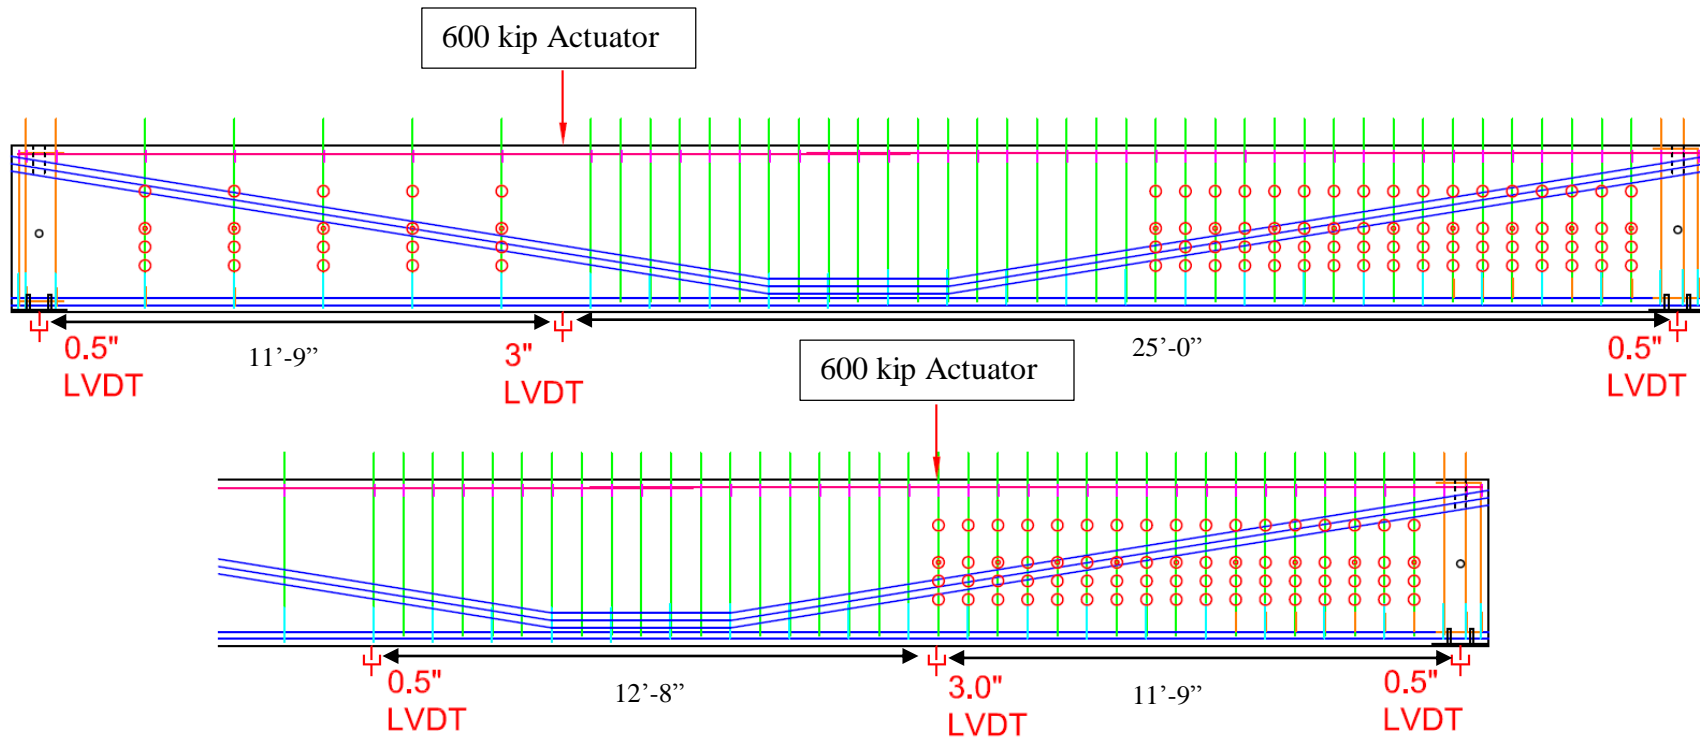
LVDT locations for the first (top) and second (bottom) tests on the 45M prestressed concrete girder.
